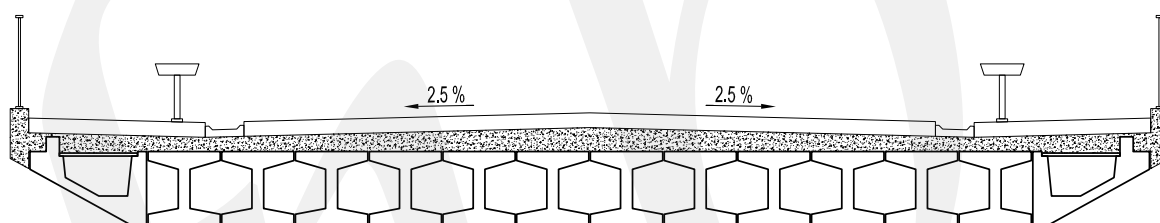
Bridge superstructure with 2.5% transverse slopes.
